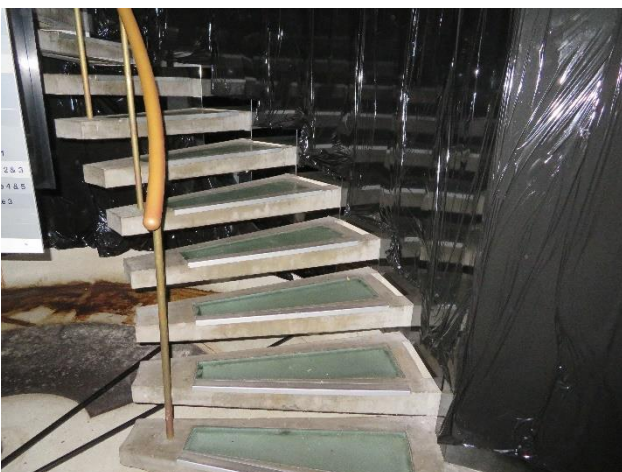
Detail of stairs and brass handrail at ground-floor level.
